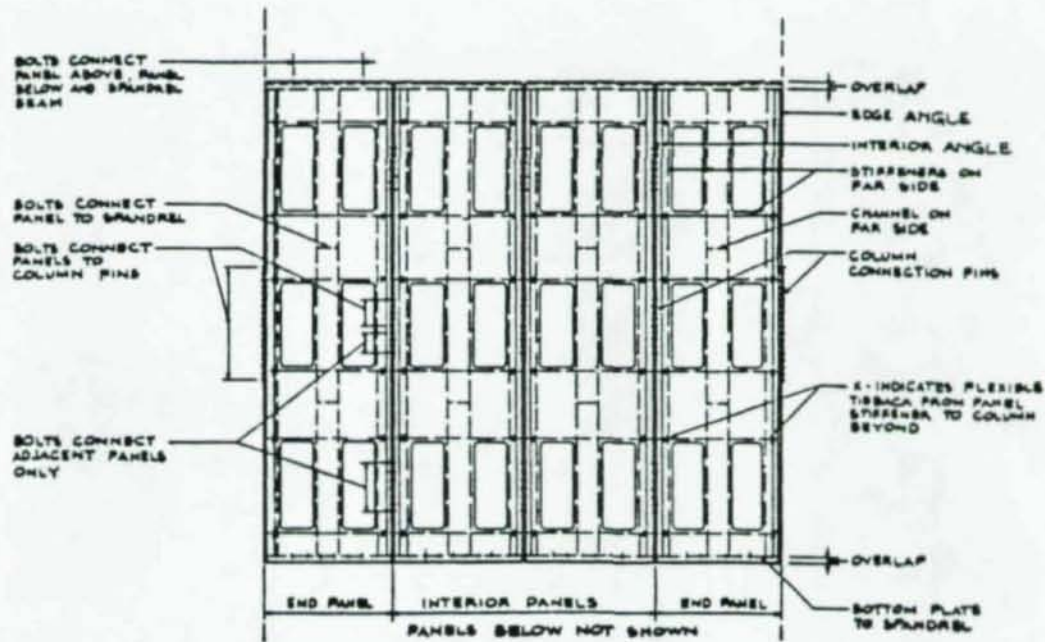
Typical Elev. of Cladding Panel from One Mellon Center with column covers removed. Diagonal face shown.
